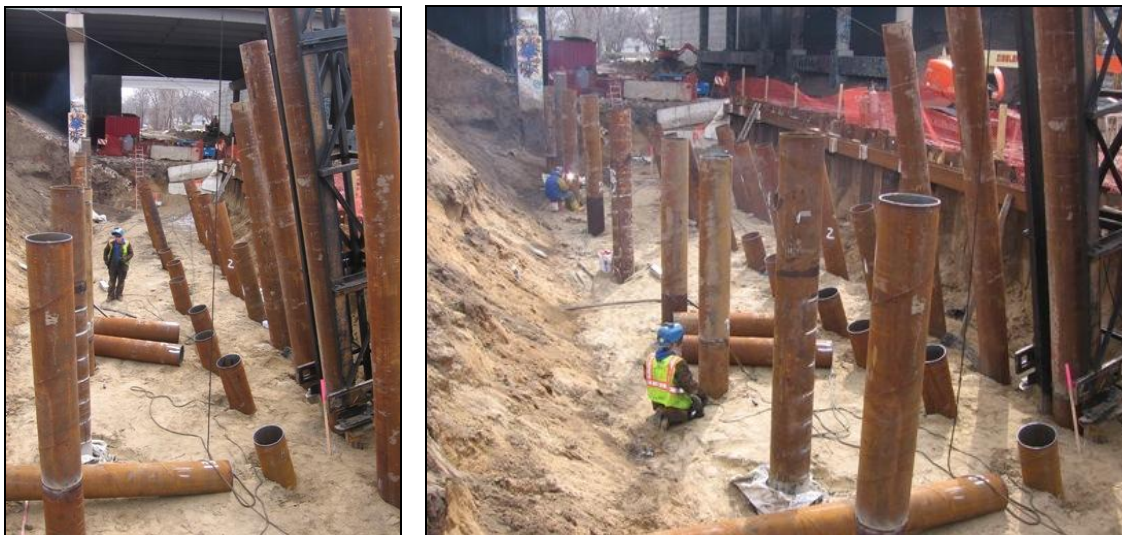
Pictures of Instrumented Piles and Additional Piles at Project Site.
